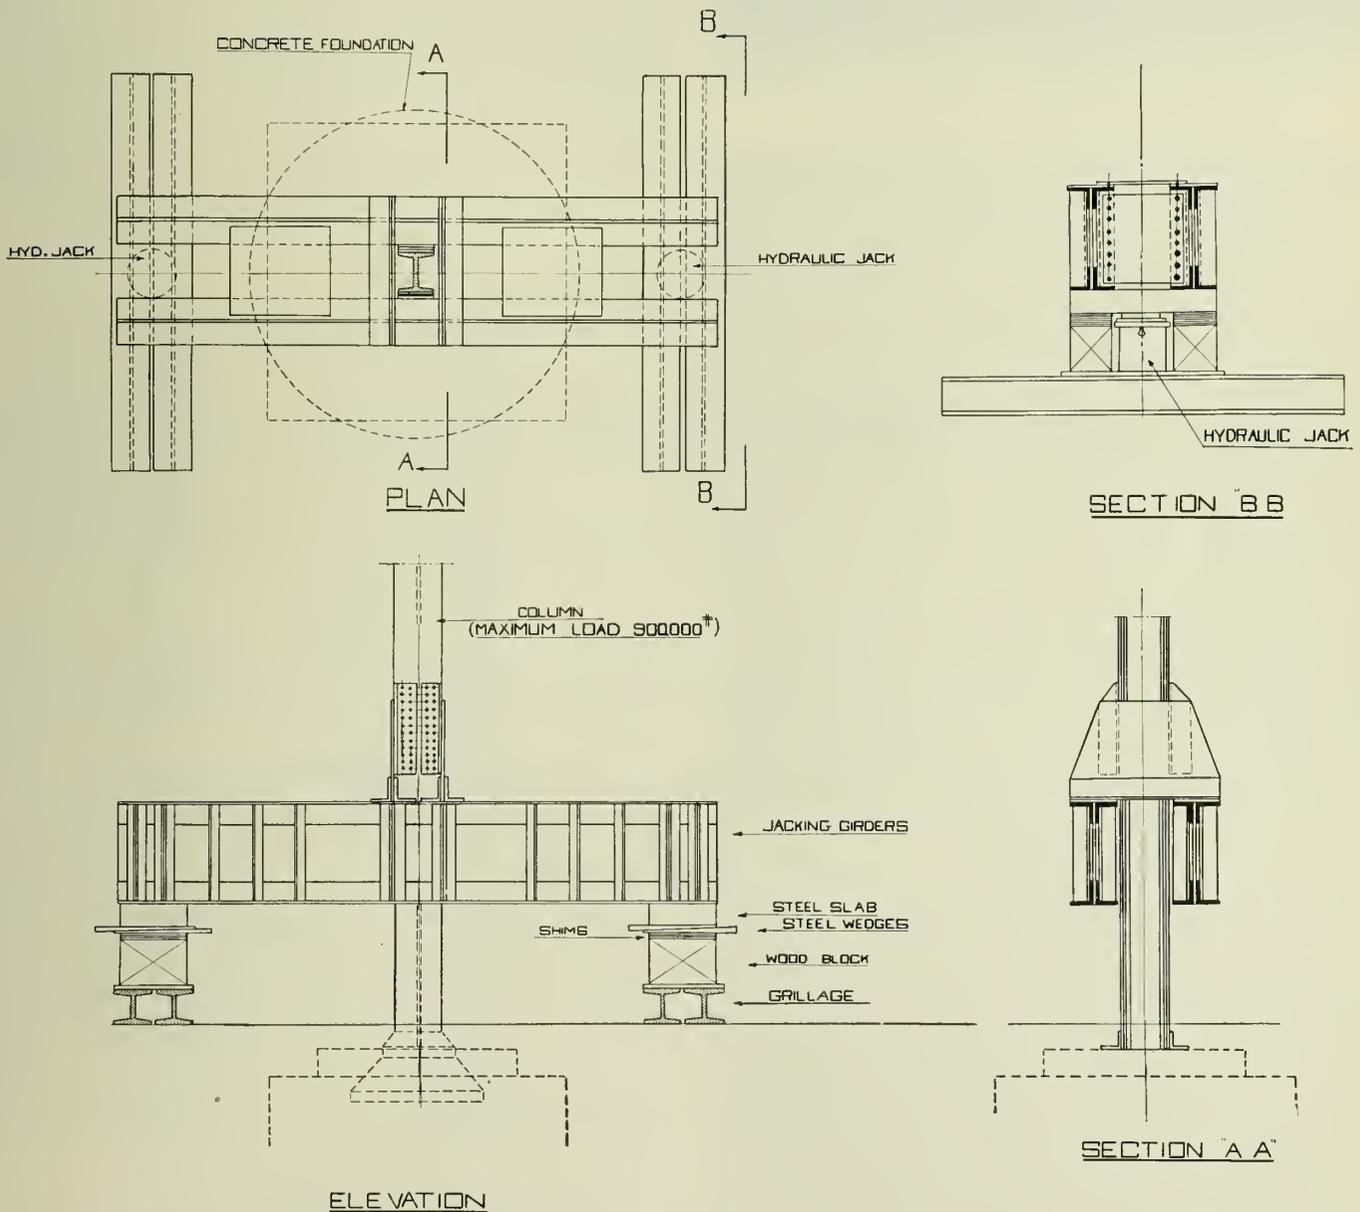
Arrangement of Girders for lifting Existing Columns.
